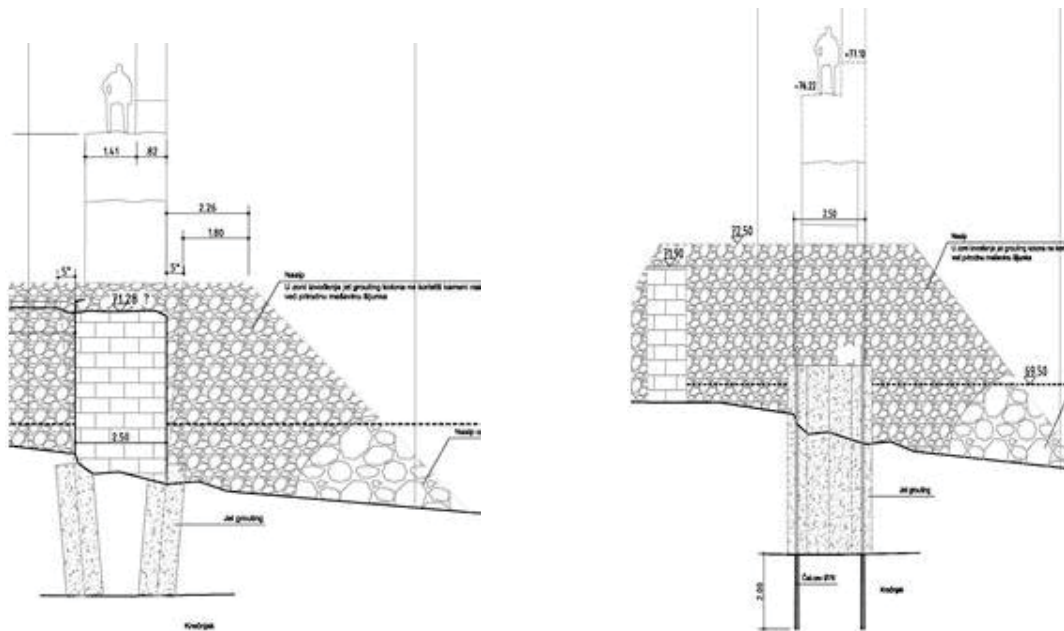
Left, strengthening of existing foundations; right, construction of new foundations
